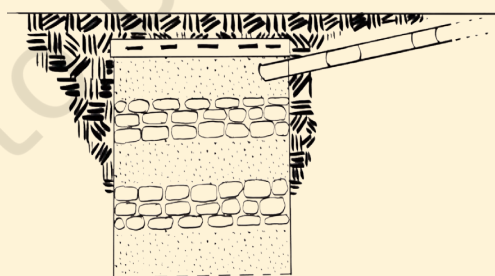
A drum placed in a soakpit and connected with pipe (cross sectional view)
